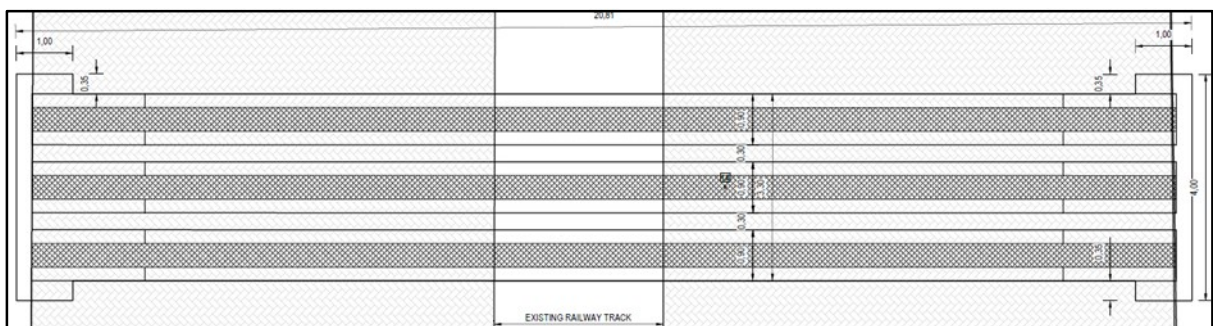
Plan view of proposed channels at railway crossing 2 between positions IAE SW3 and IAE SW4
